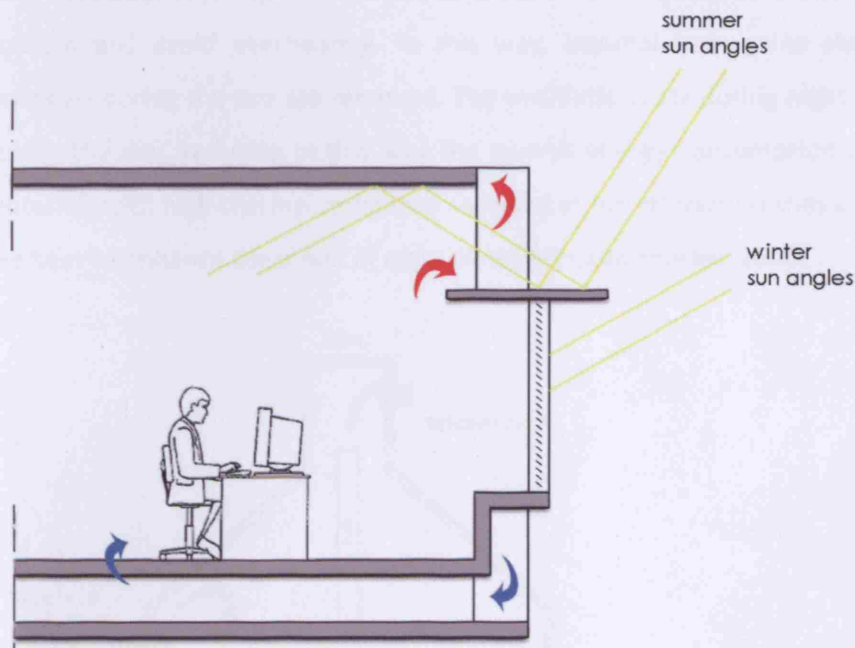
Ventilative facade and daylight strategy for Portcullis House
